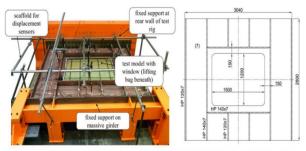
Model 1 mounted in the test rig (left) and steel structure of test models 1 through 3 (right)
